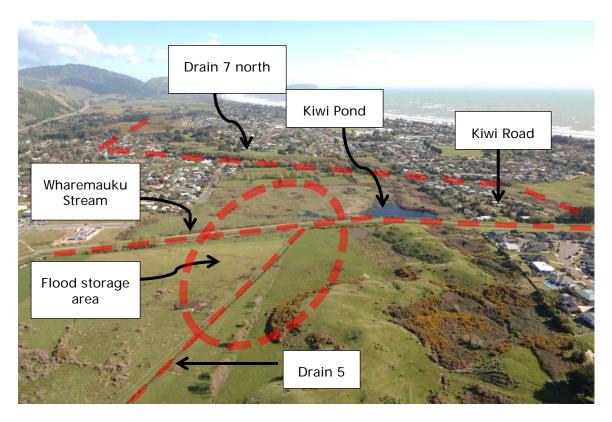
Wharemauku Stream flood storage area. The floodway corridor can be seen to the right of Kiwi Pond.
